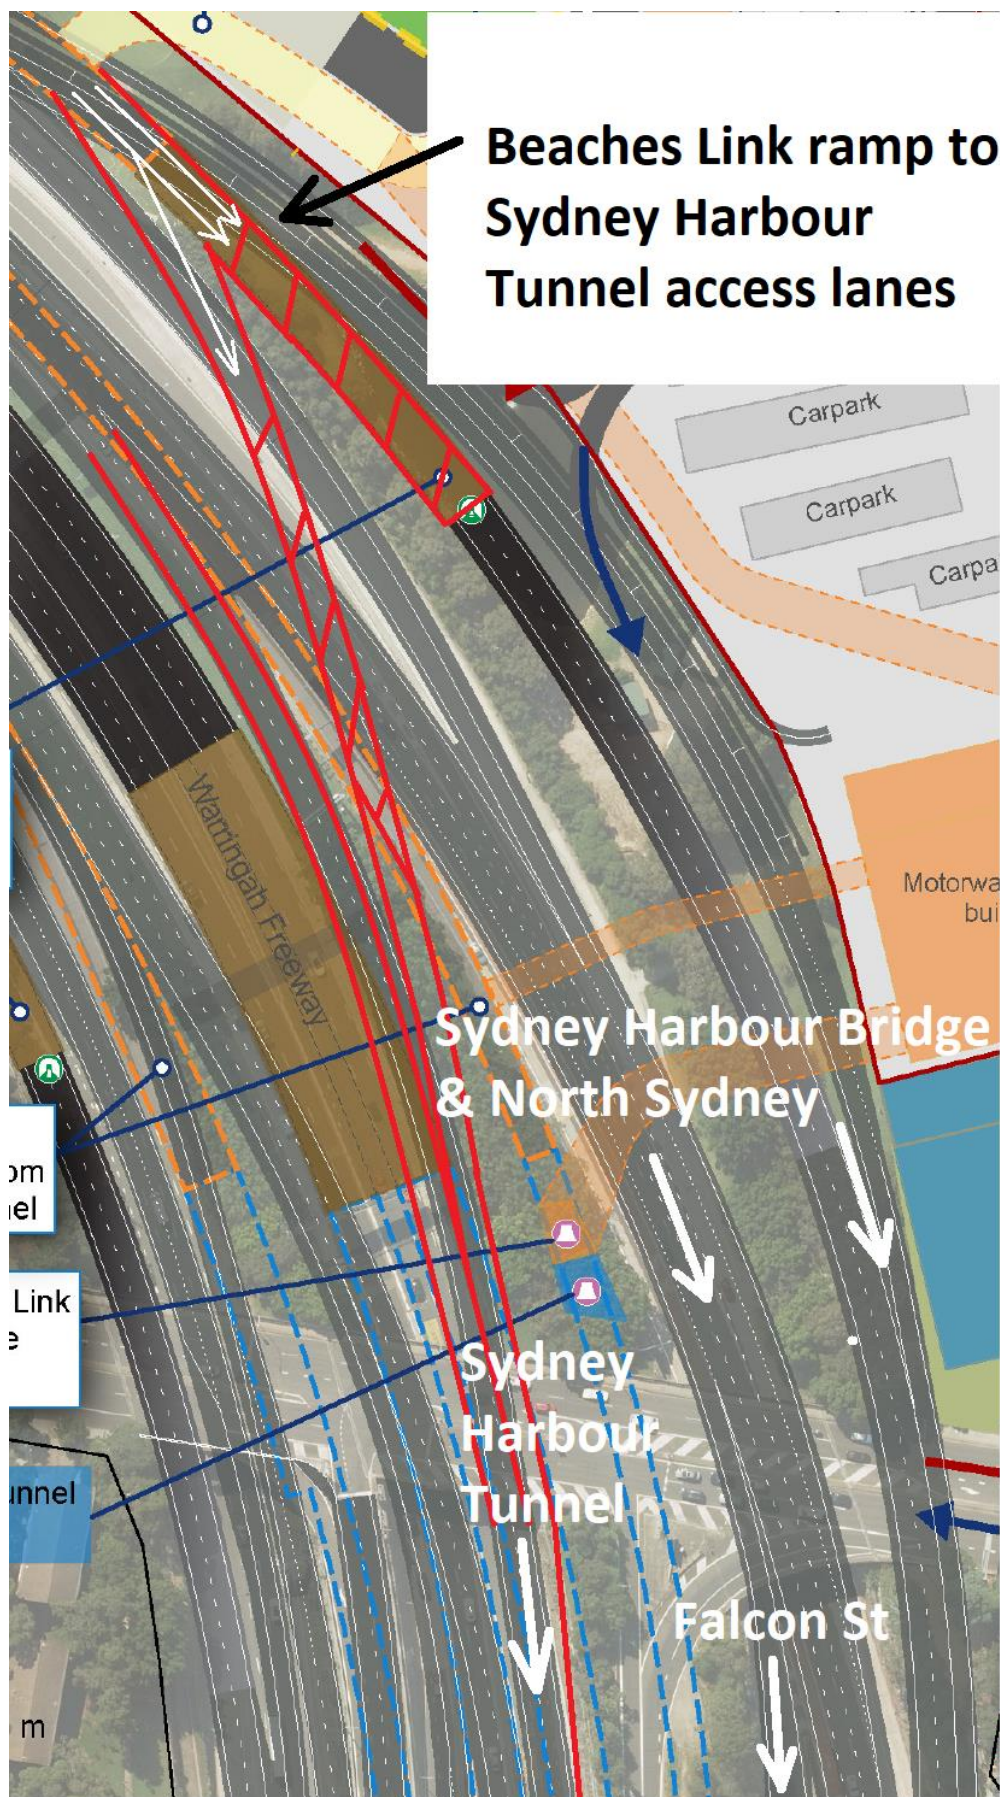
2<sup>nd</sup> illustration – Beaches Link southbound exit to Harbour Bridge and North Sydney bifurcated to provide direct link to Harbour Tunnel ramps
